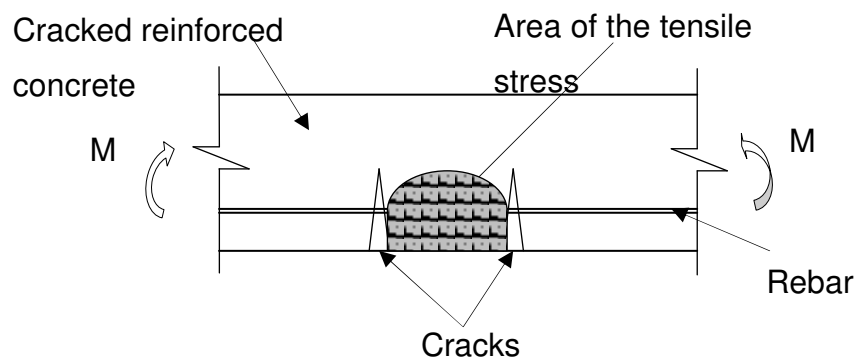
the stress transformation from the reinforcement to concrete through bond
